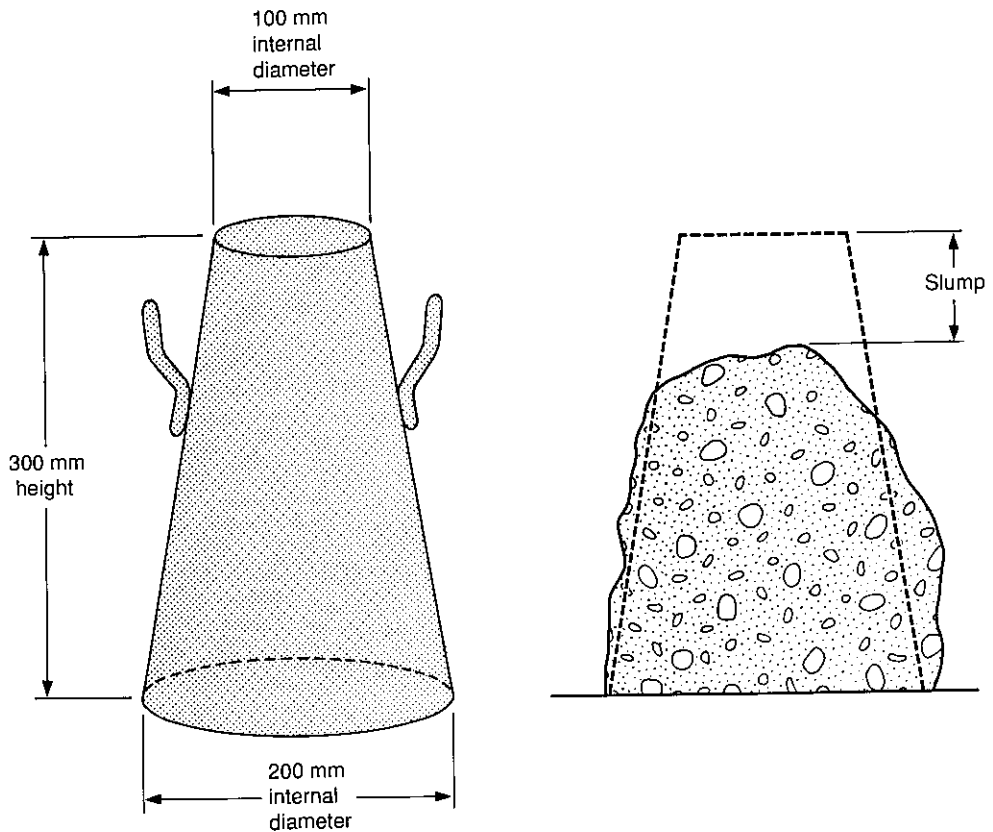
The Slump Cone for measuring the workability of concrete.
